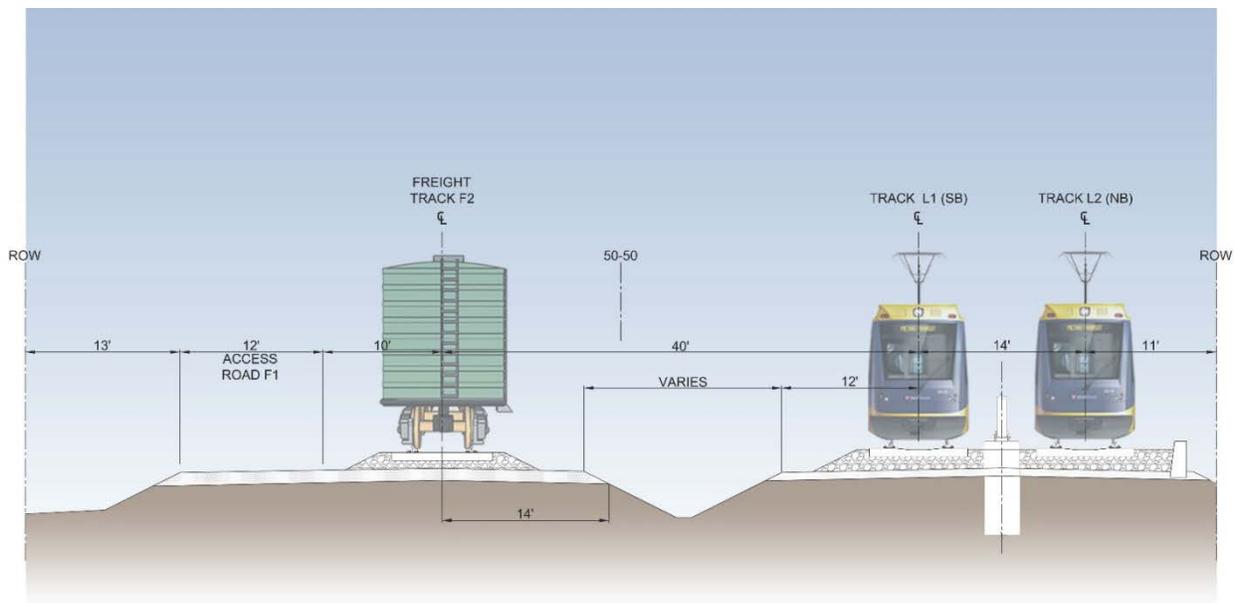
Typical Railway Section – Retained Embankment Corridor Protection
